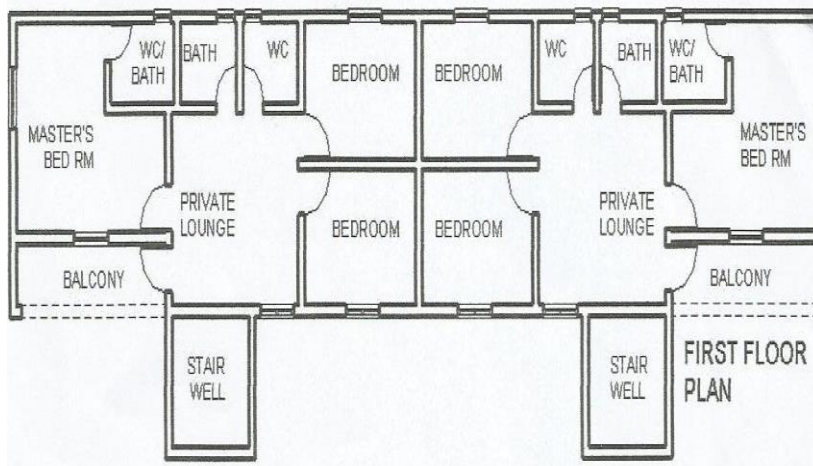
Floor Plans Profile- Trans Ekulu Phase II
